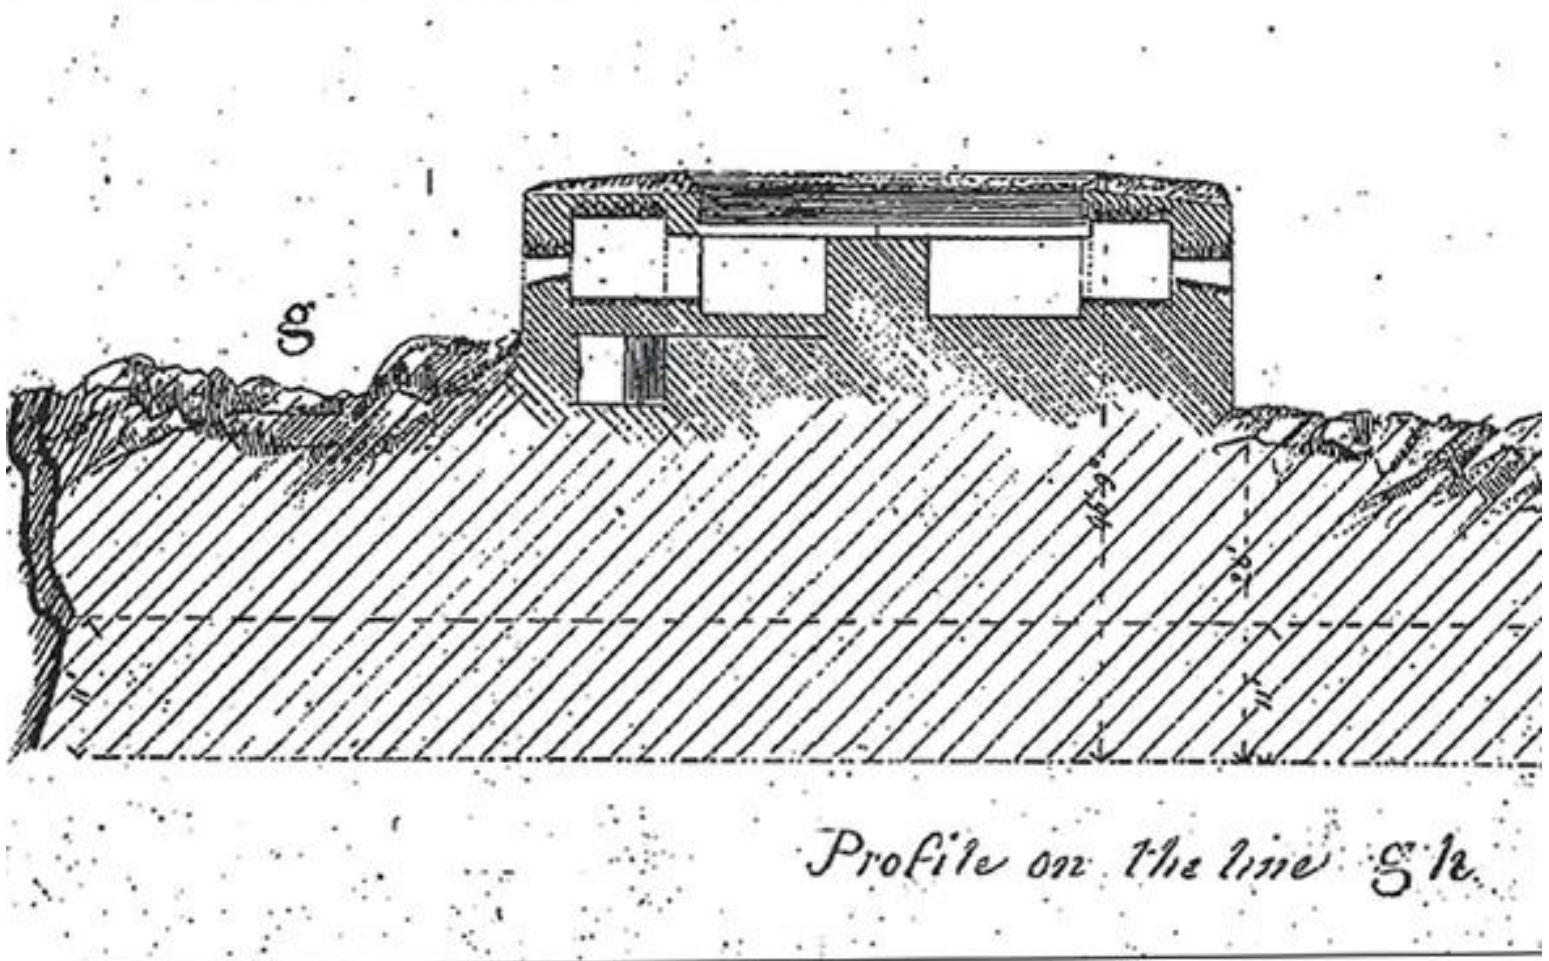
Cross-section of Walbach Tower (detail of Figure WT-12).
